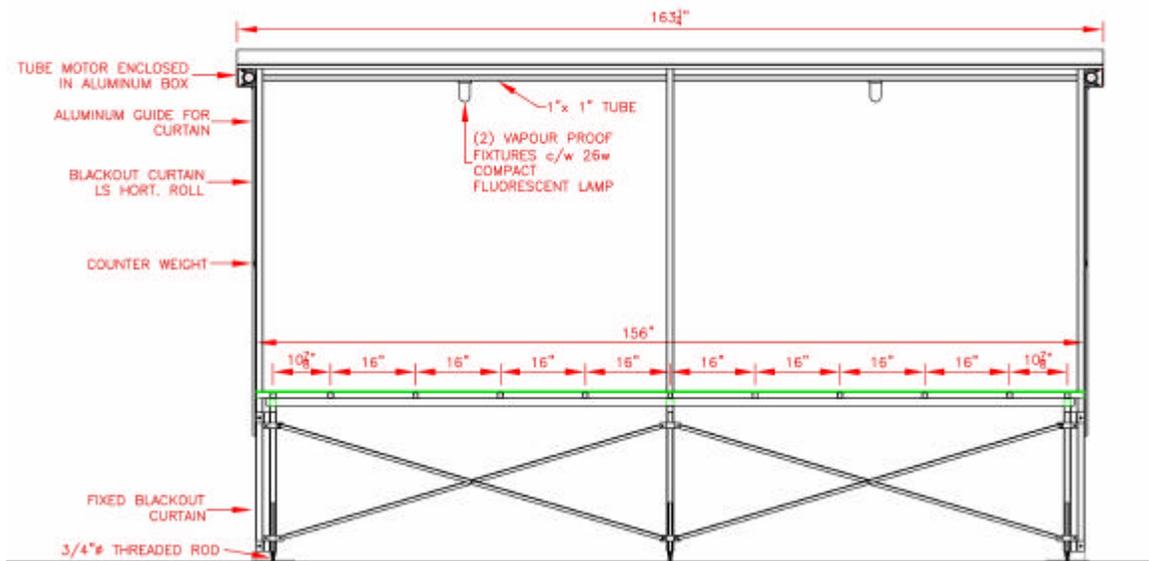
University of Guelph Bovey Complex - Greenhouse Blackout Bench - Longitudinal Section
